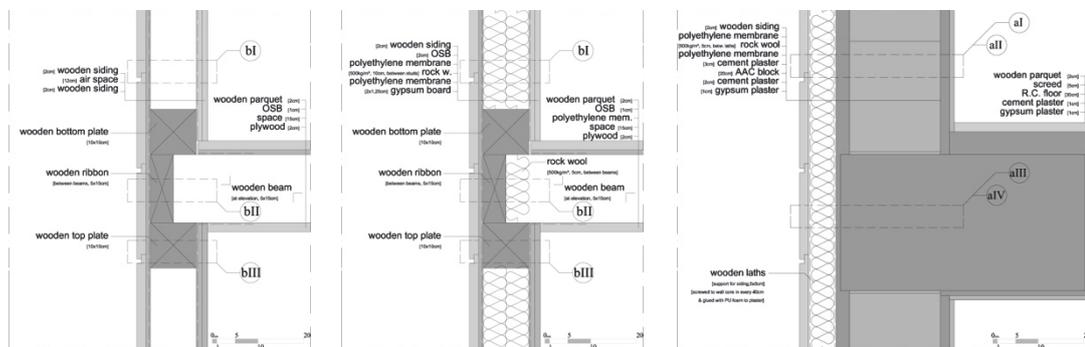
(Left) section of the original buildings external wall details; (middle) section of the external wall of the reconstructions with wooden stud walls; (right) section of the external wall of the reconstructions with blockwork walls (Source: Author).
